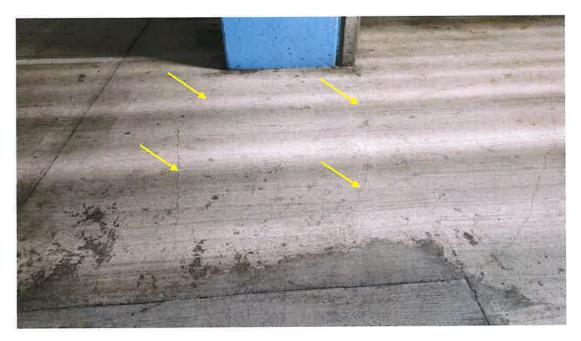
Shrinkage Cracks at Floor of Second Floor Level
